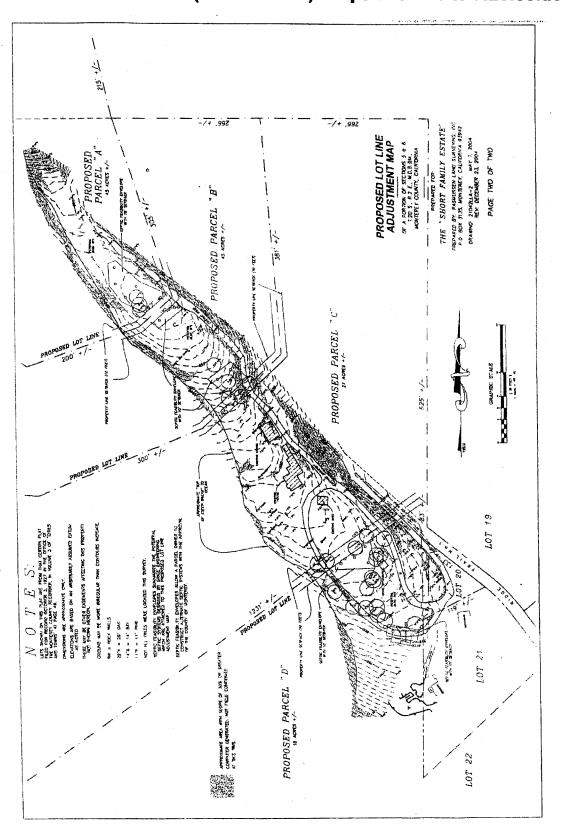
of 2 Site Plans – Showing Potential Building Sites
